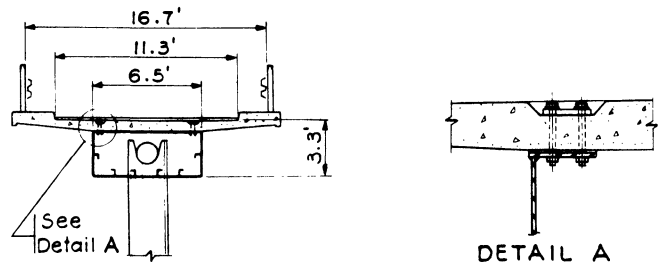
Curved viaduct ramp, Hannover, Germany (1961). Span 67 ft. A continuous single steel box, curved in plan, with precast concrete deck slab. The slab is connected to the box by high strength bolts to achieve composite action by friction. Part of this structure was built on a horizontal curve with a radius of curvature of 30 ft
